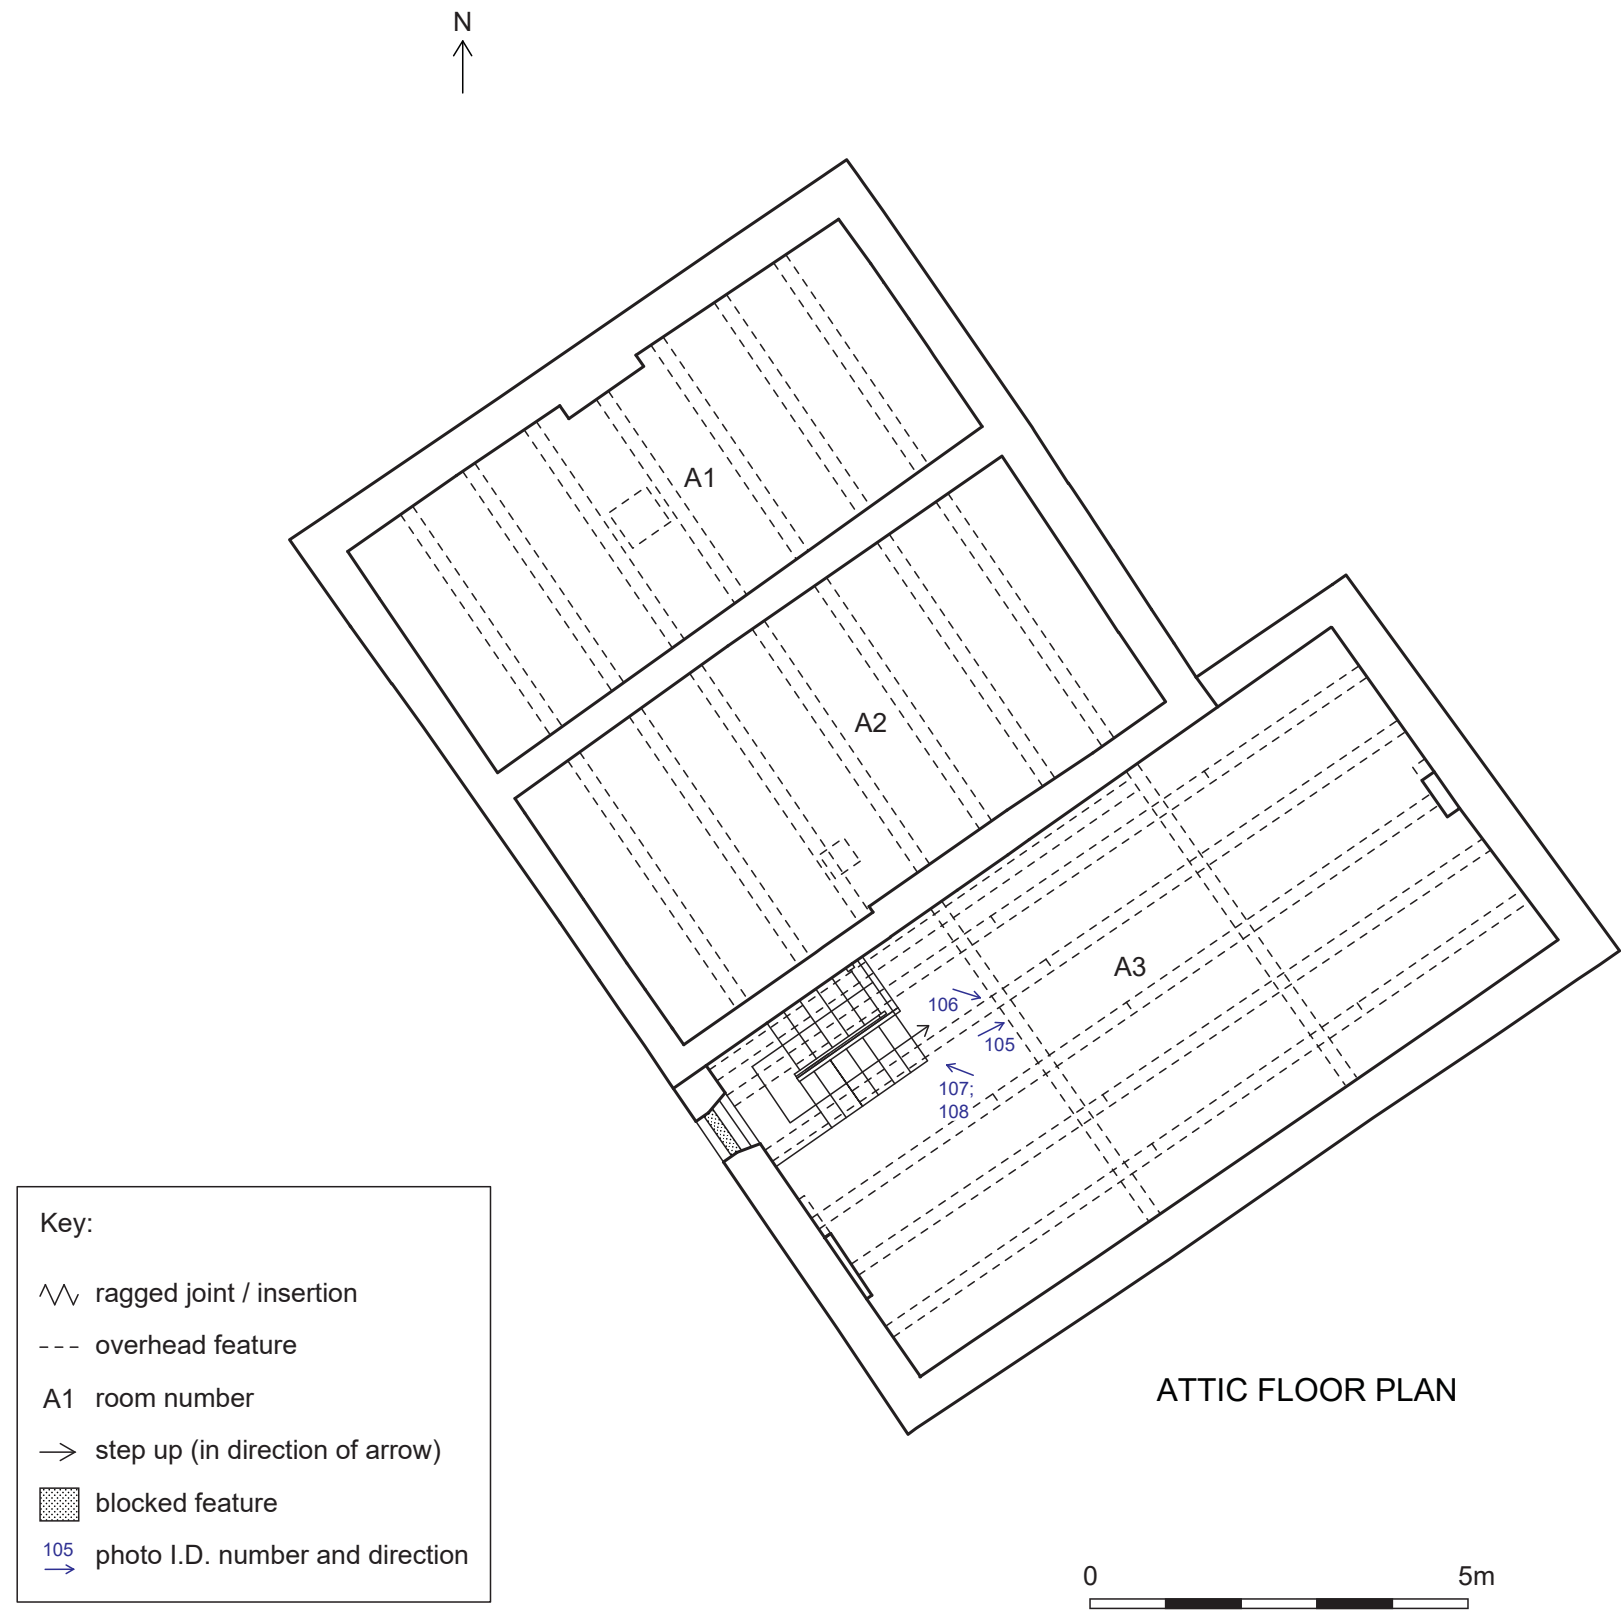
Attic floor plan of the farmhouse, showing the location and direction of photographs taken
